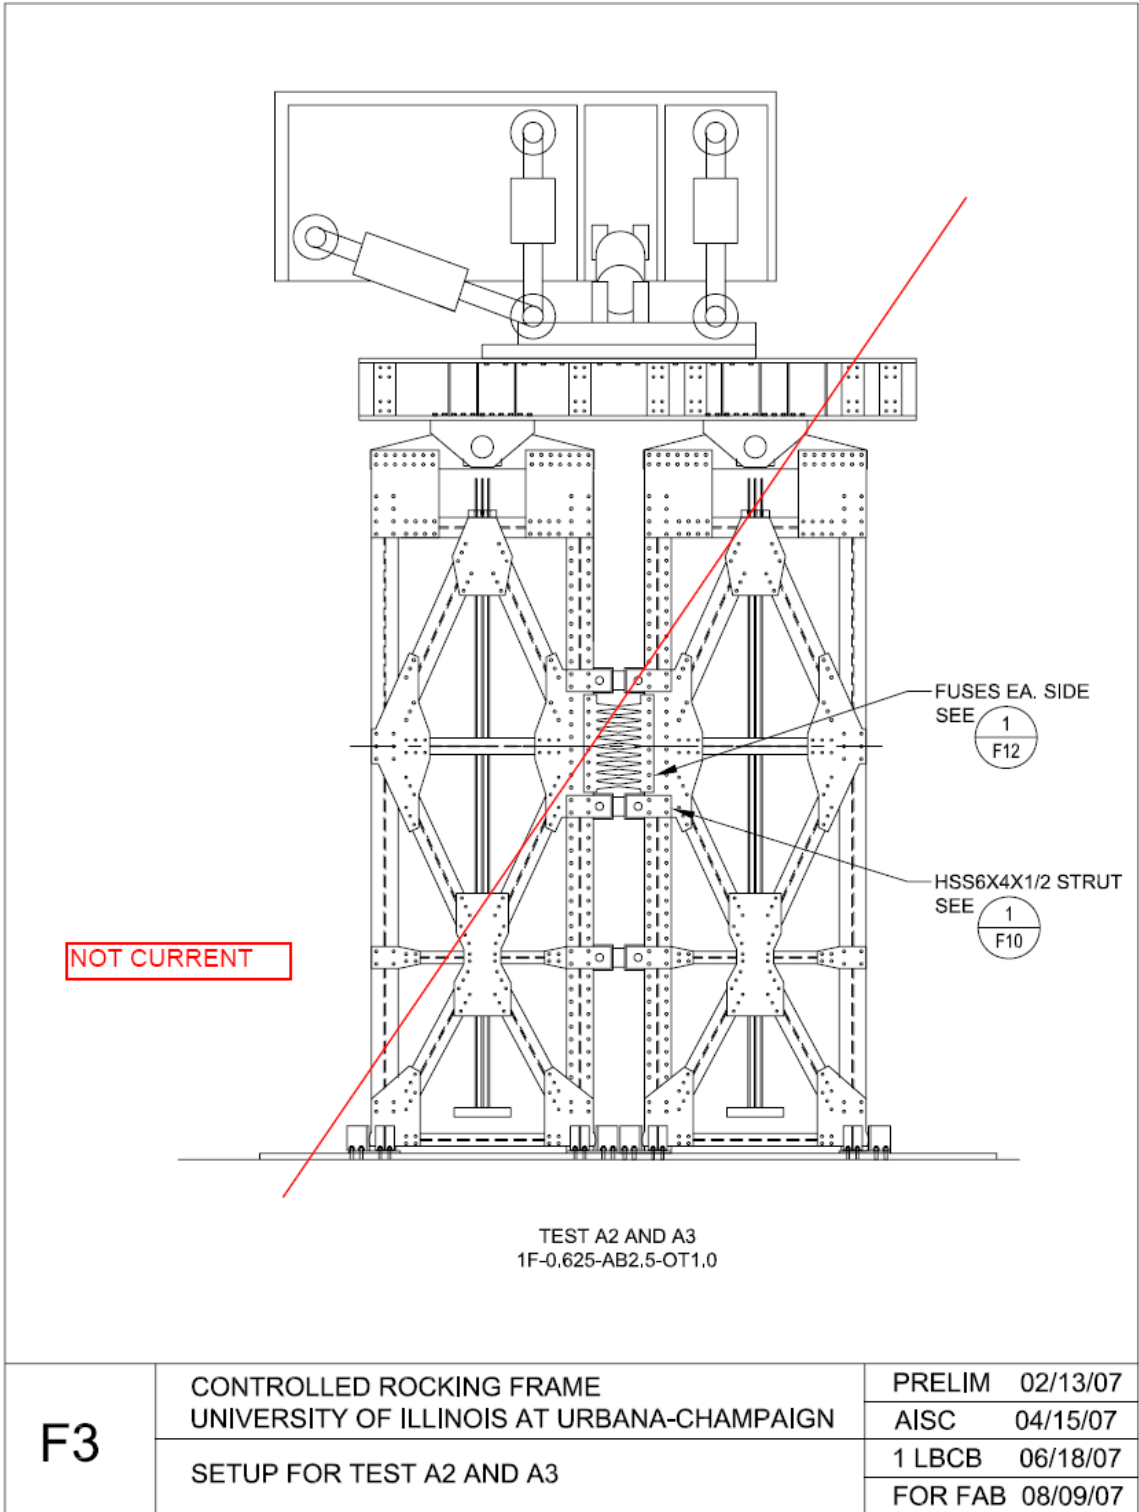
Specimen Design Drawing – Setup for Test A2 and A3
